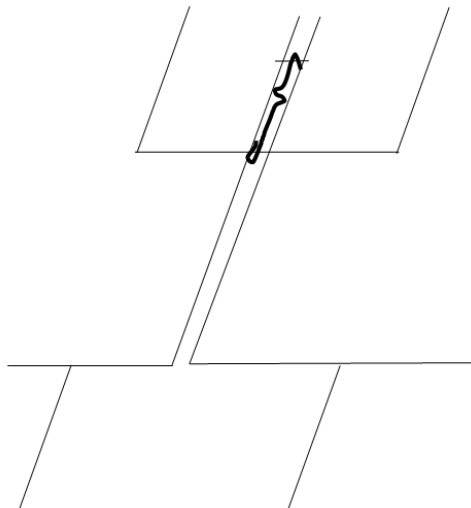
At pitches of less than 30° hooks with crimps in the plane of the slate should be used.
